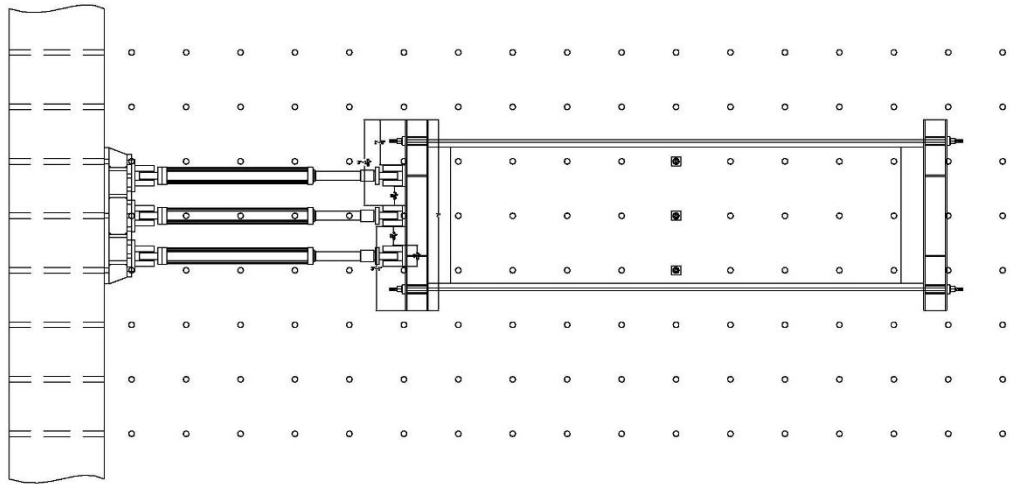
Geometric configuration drawing of the 1/3 scale reinforced concrete tunnel specimen
